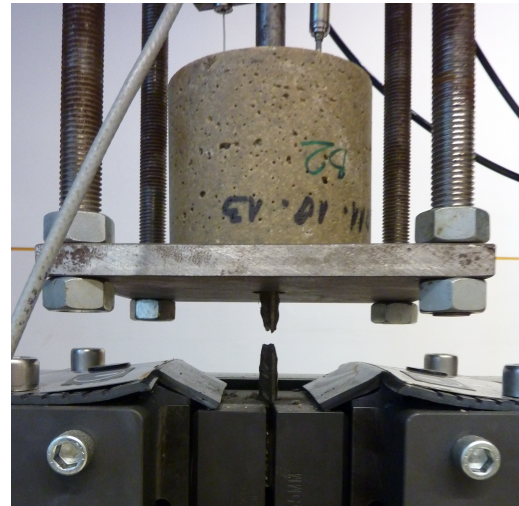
Failure of specimen by the reinforcing steel bar being torn
